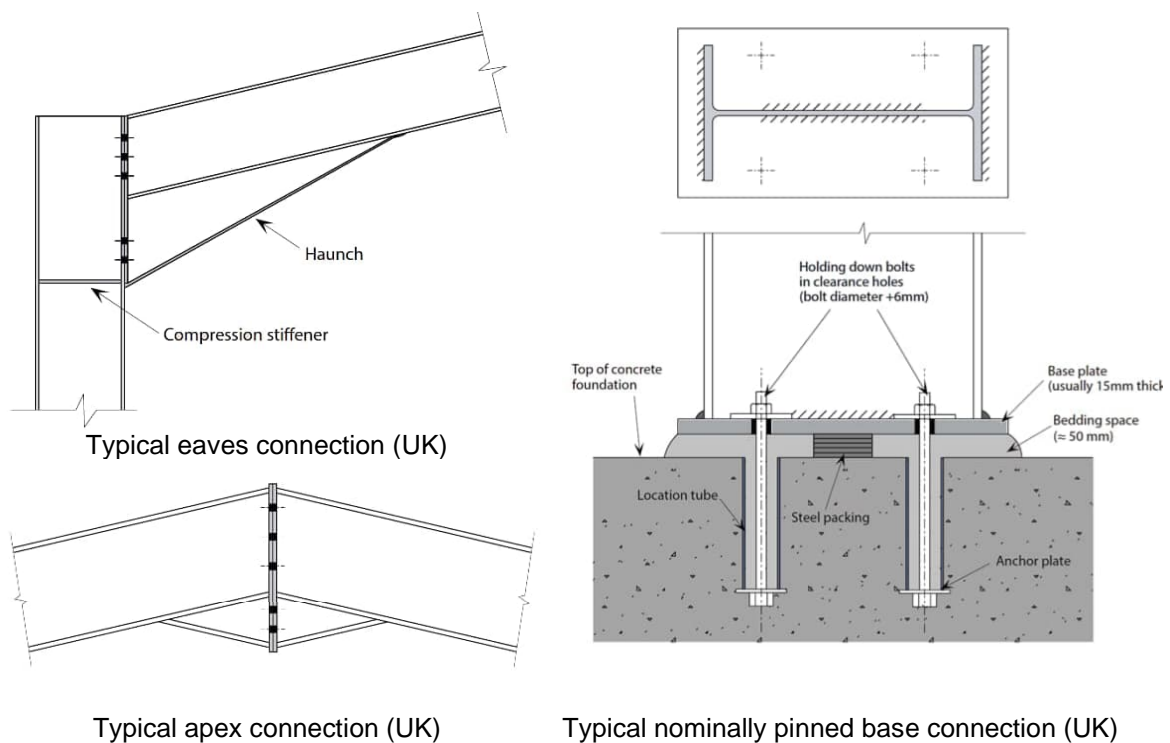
Typical detailing for a single bay portal frame with nominally pinned bases [4]
